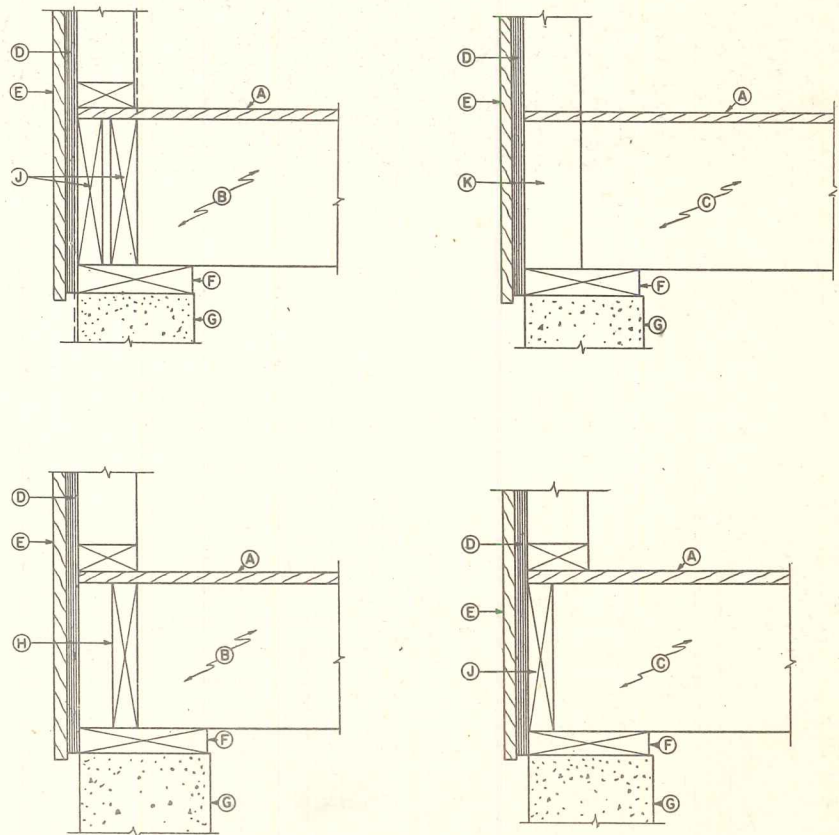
Standard sized joists may be cut as at C or blocked as at B to fit modular layouts.
